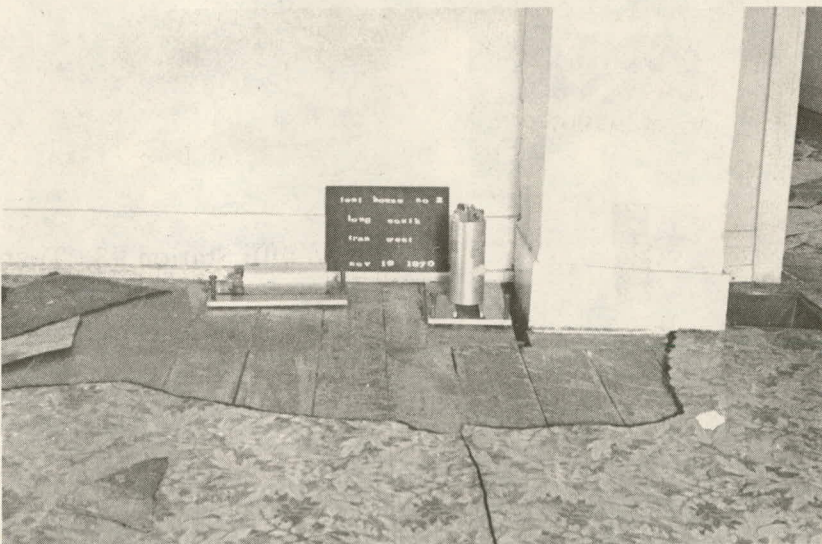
Station #2, Test House #2, Nov. 19, 1970. Seismometer location on second floor, center.
